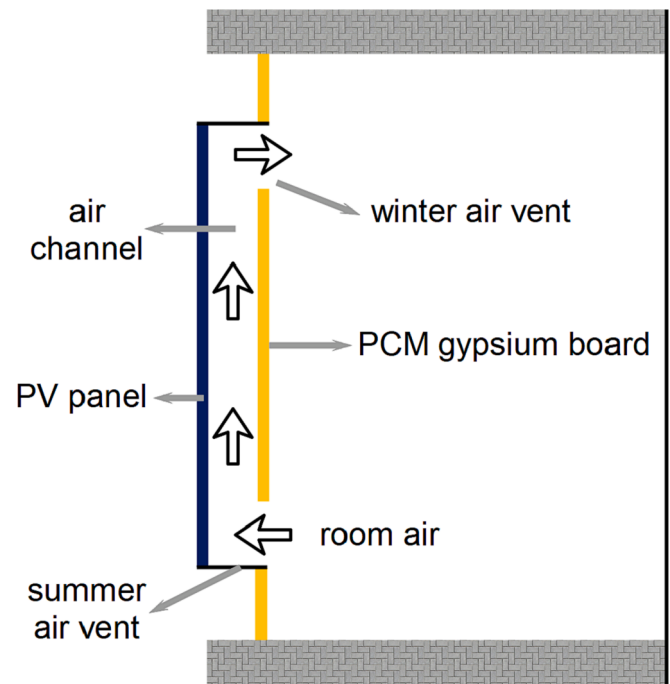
System configurations of a PCM-added BIPV/T façade system, adapted from [85].
